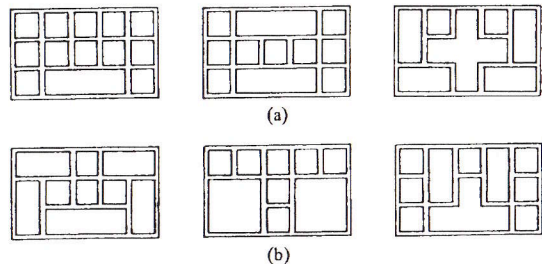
Plans shown in (a) satisfy proviso 2; plans in (b) fail to do so.
